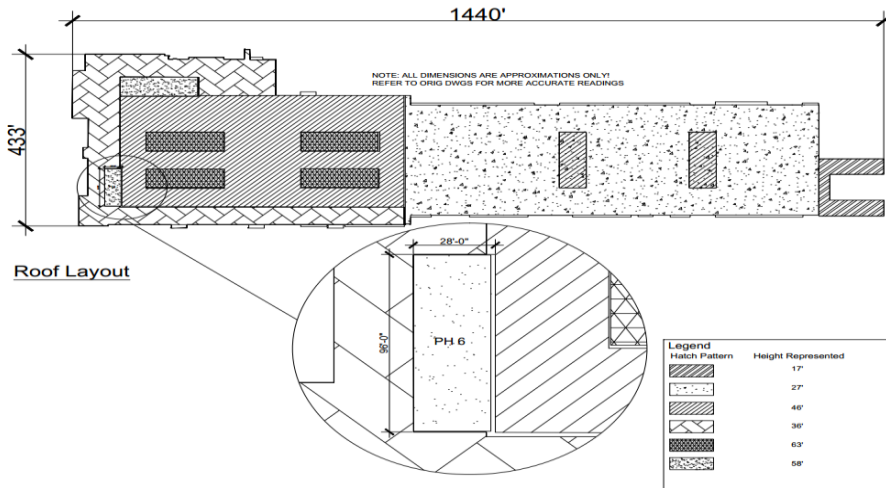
Roof layout and Penthouse 6 (PH 6) location
